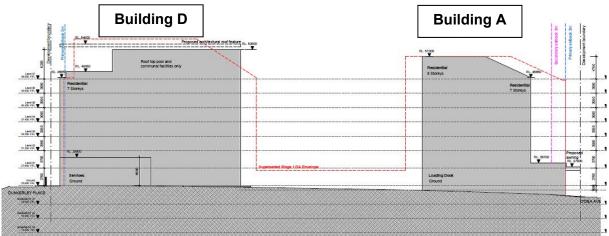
Hatter Place elevation illustrating Building D and Building A envelopes.
